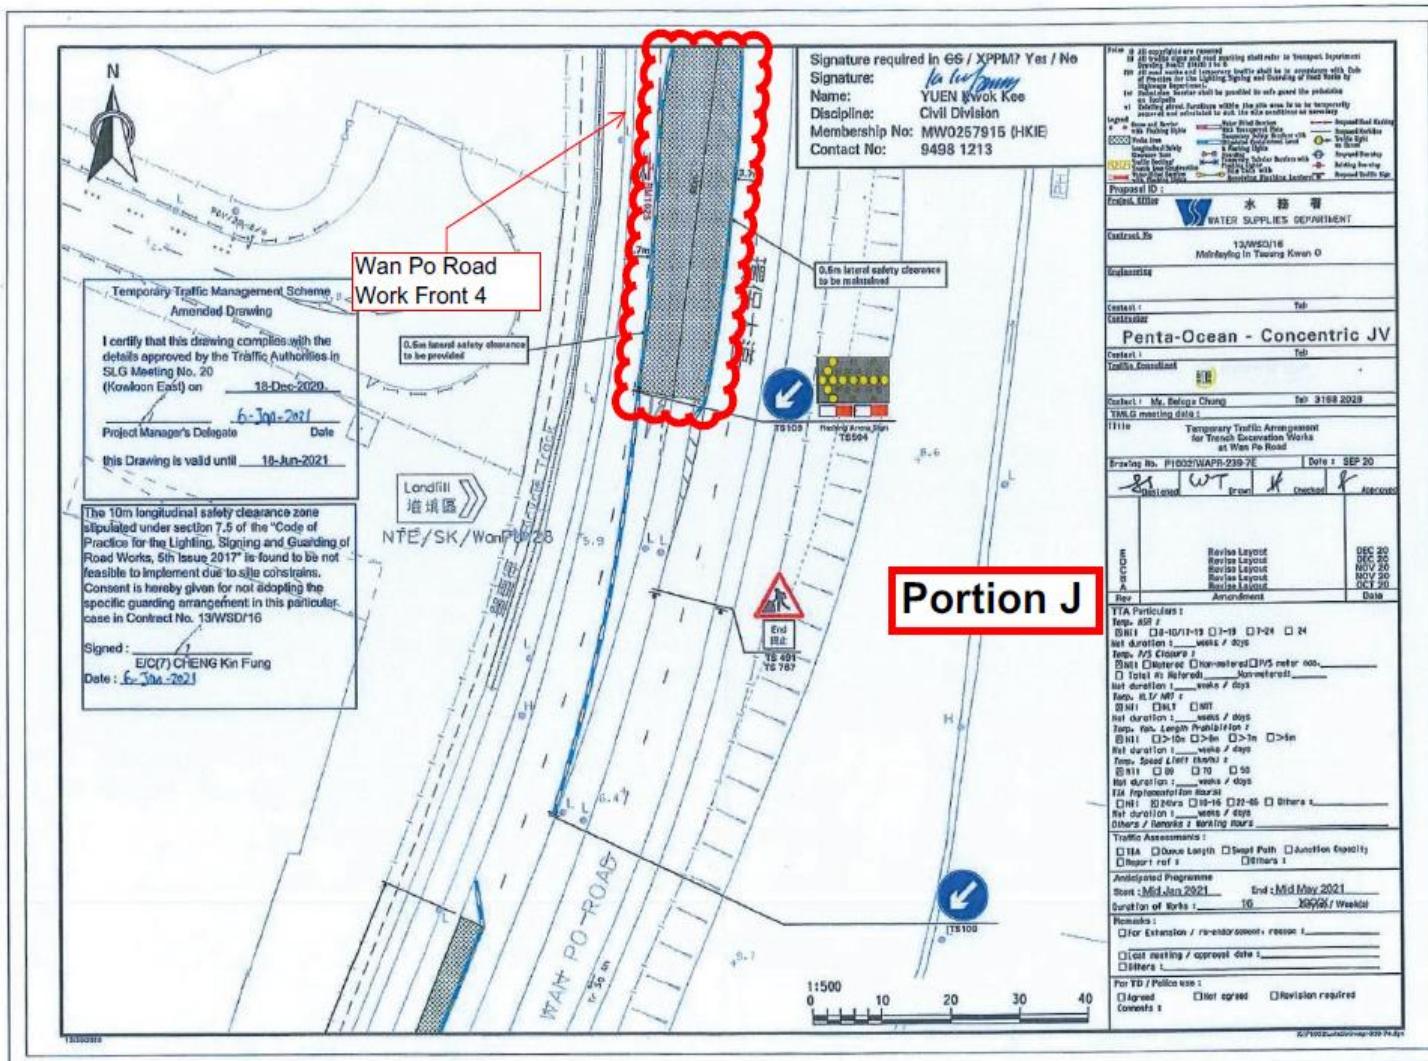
Location Plan for Portion J – Wan Po Road 4
